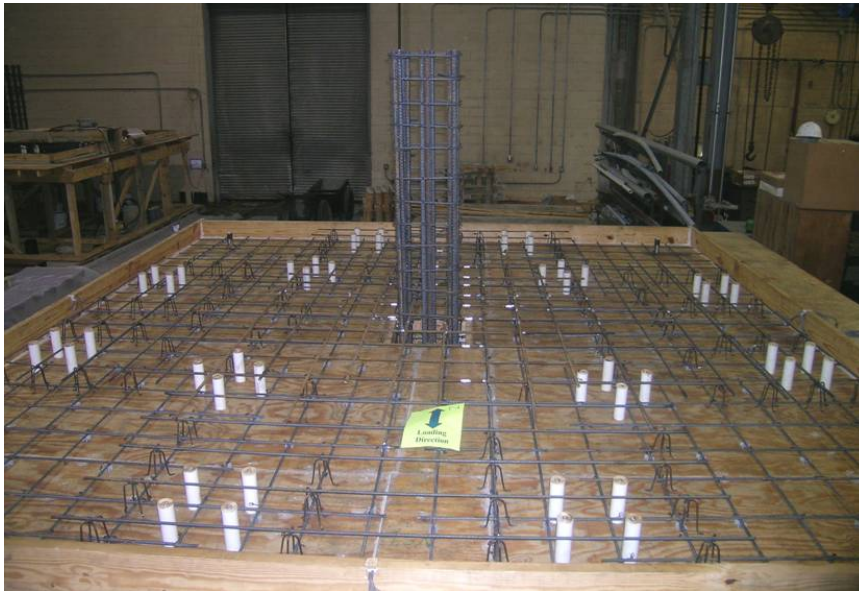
Steel reinforcement prior to placement of concrete pour
